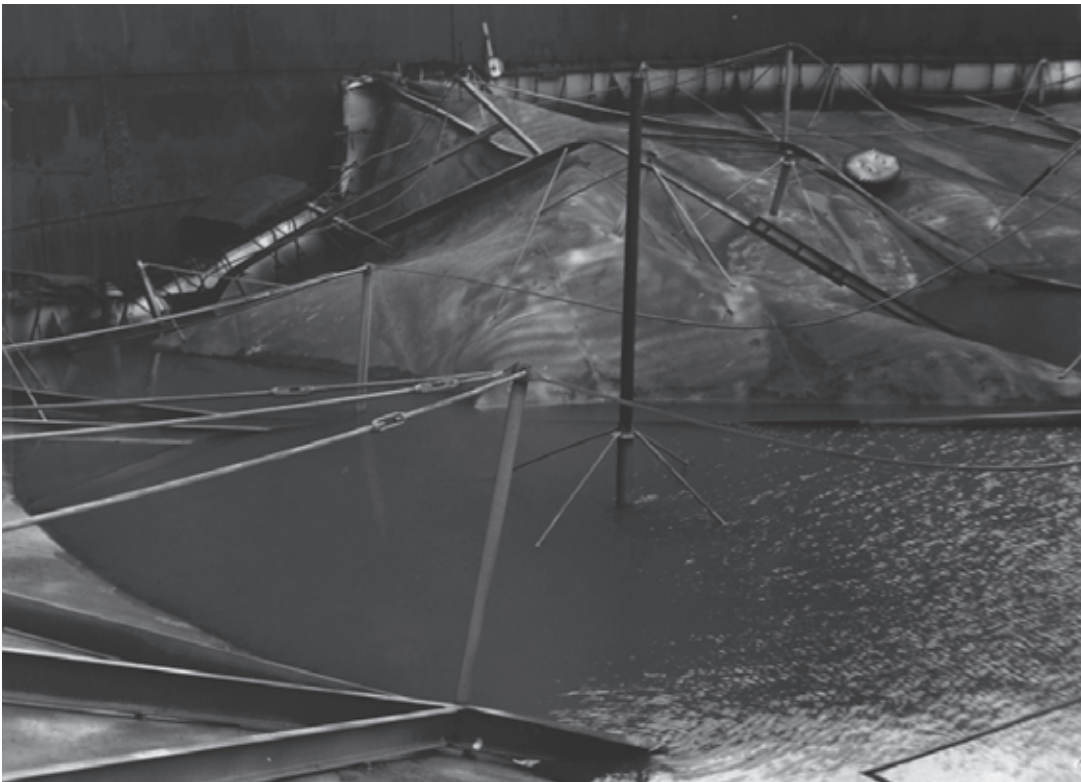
Collapse of Pan-type Roof from Excessive Weight of Water While the Roof was Resting on its Supports
